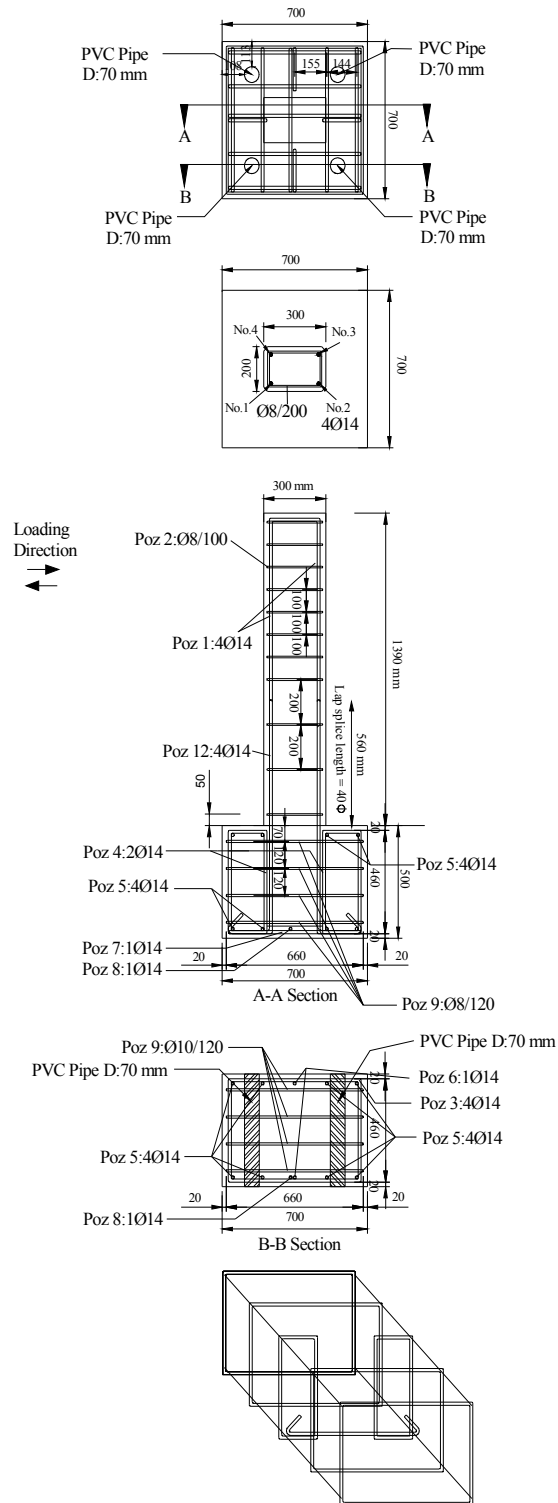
Reinforcing cage of the first type specimens (south side).
